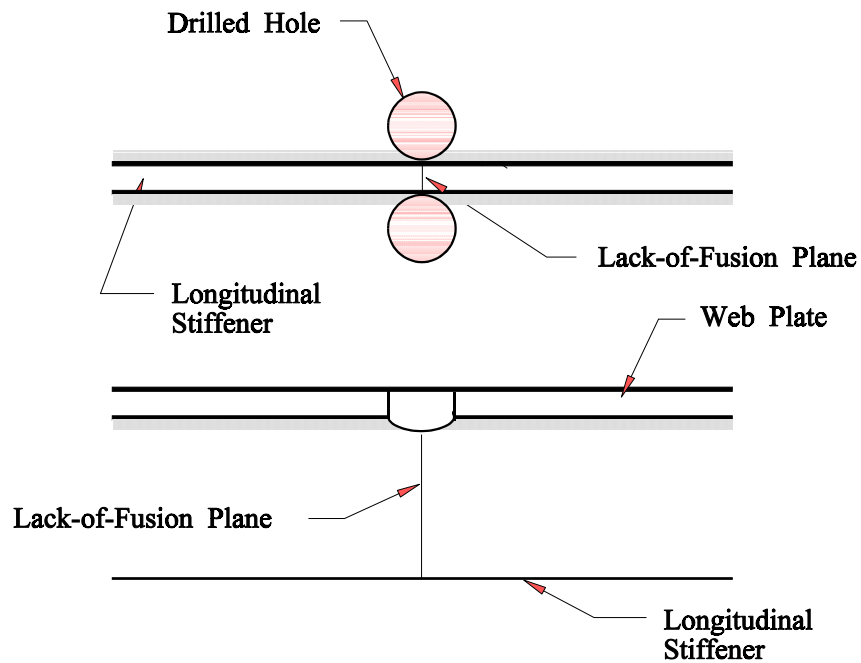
Drilled hole positions for longitudinal stiffener lack-of-fusion plane.
